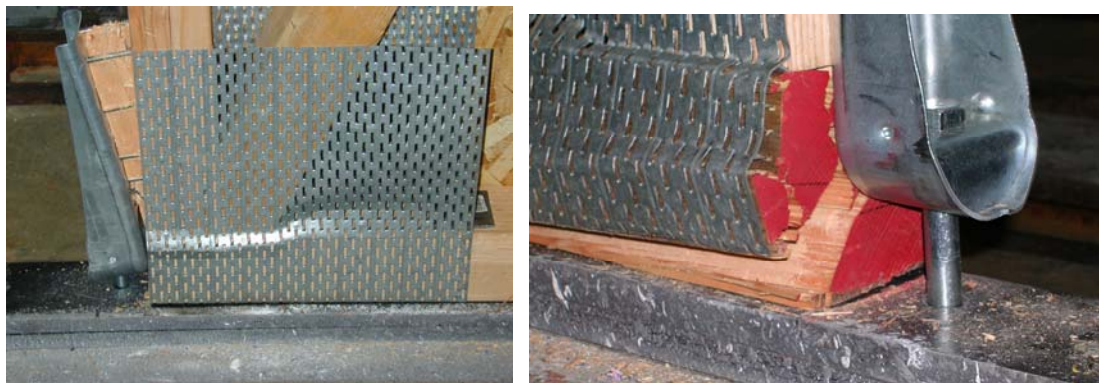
Failure of the hold-down and buckling of the metal truss plate (left) and bottom-plate failure (right).
